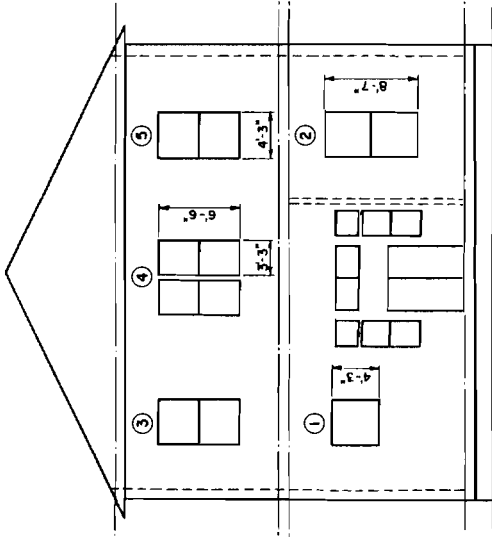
BUILDING No. 6 - TWO - STOREY SOLID BRICK
